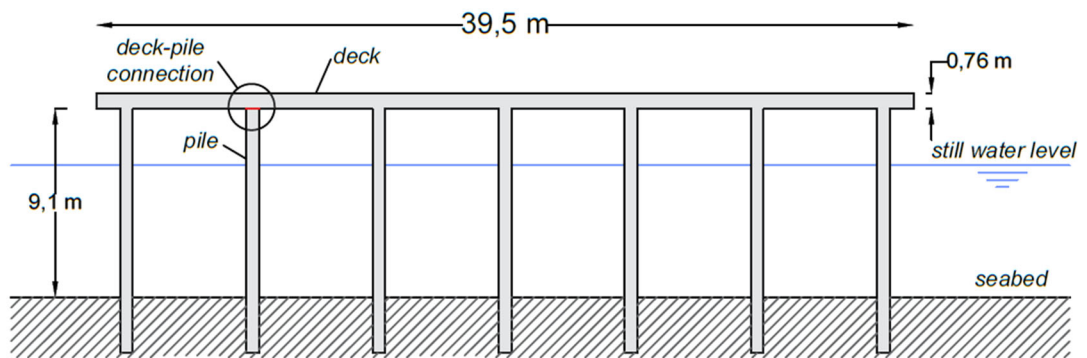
Elevation view (A-A' cut) of the typical pile-supported pier deck.
